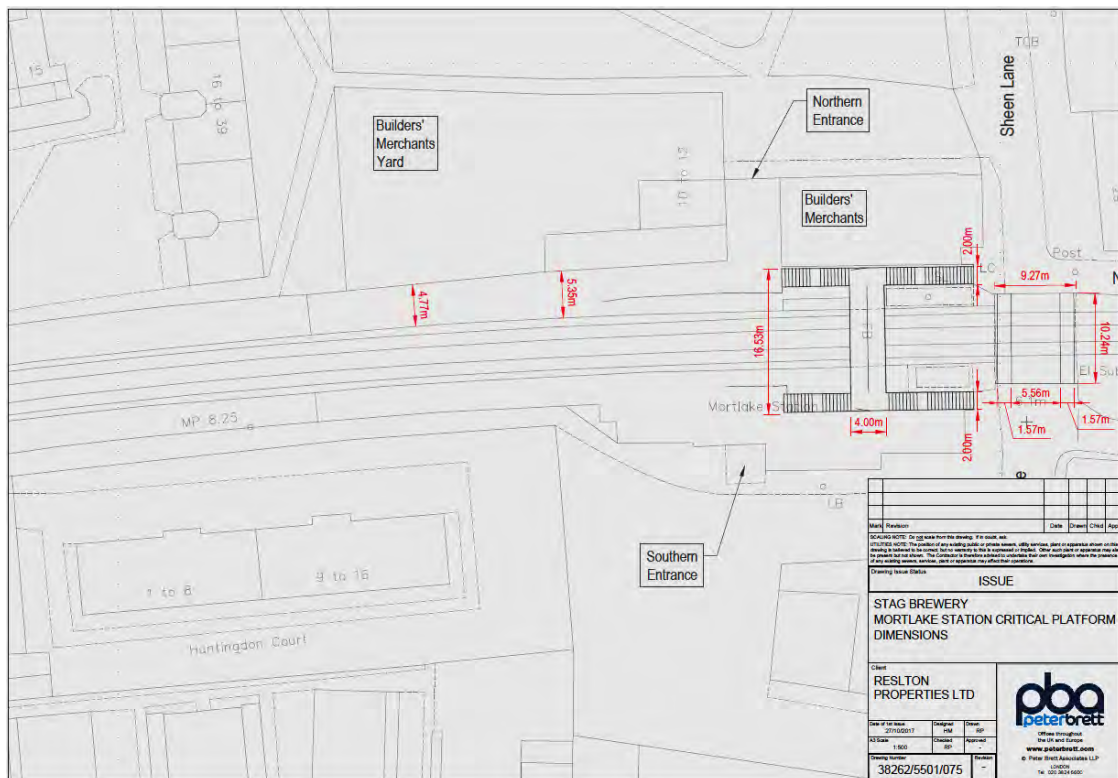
Plan of Mortlake Station Showing the Northern and Southern entrances and Footbridge
